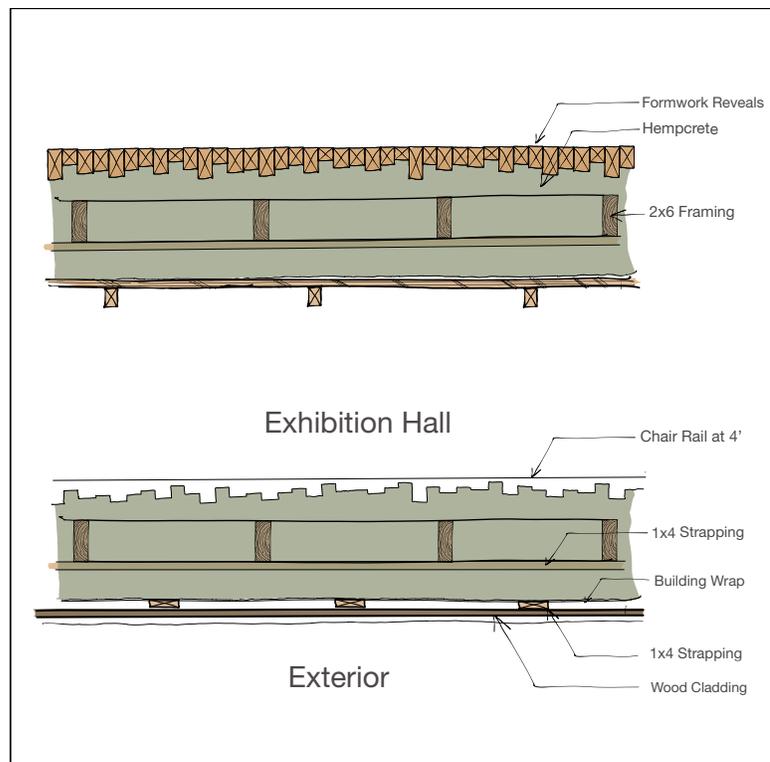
Combining ideas from concrete design by creating more elaborate formwork to create designs and patterns in the exposed hempcrete walls.
